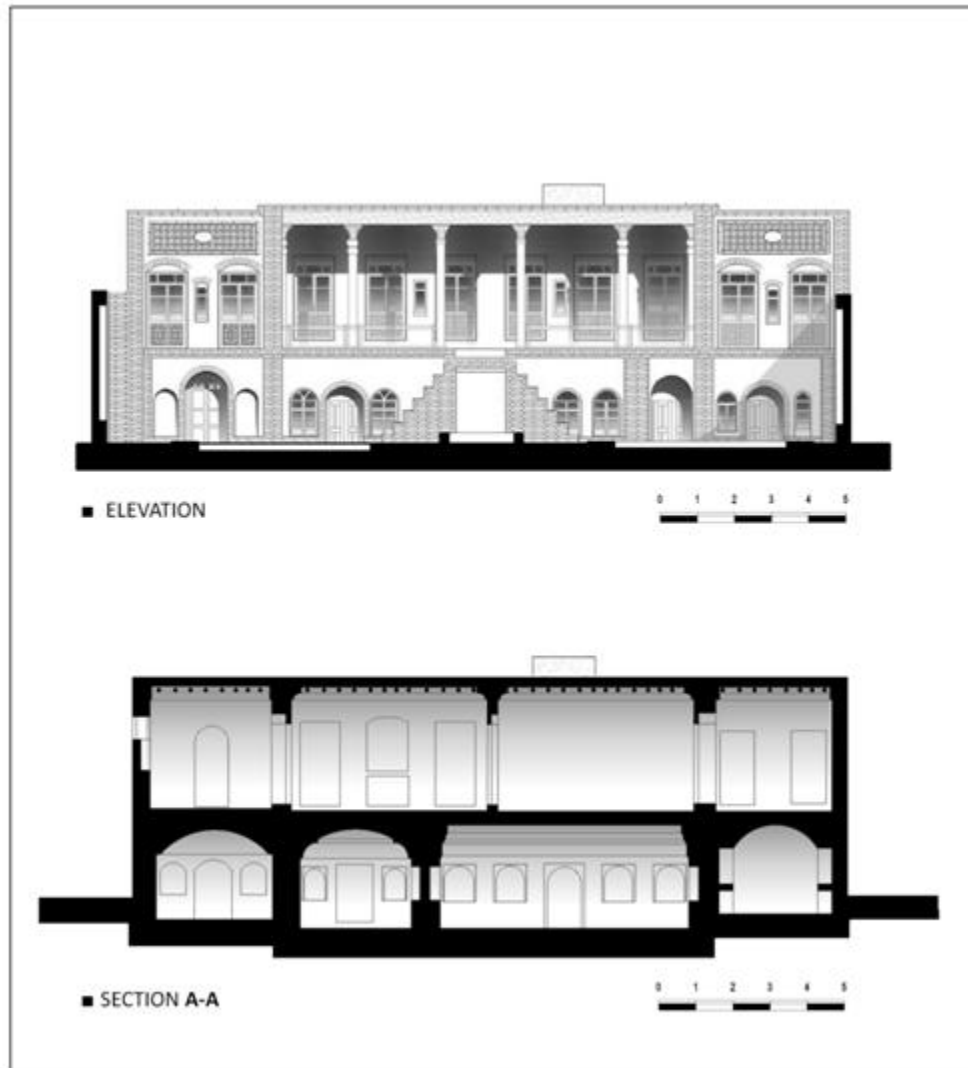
Elevation and section of the Aldaqi house (Estaji, 2010, Towhidi-Manesh, 2001a) with modifications
